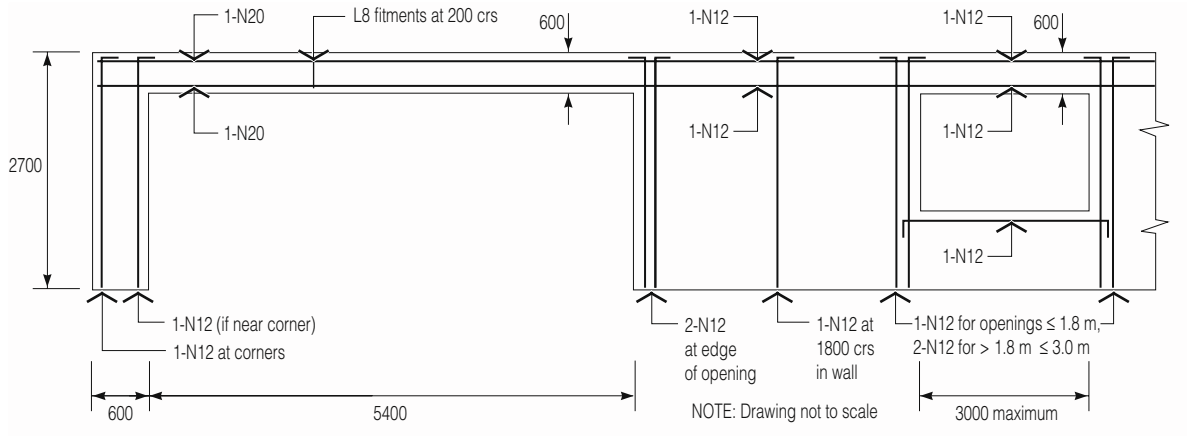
Wall Reinforcement for 190-mm Leaf for Wind Classifications N4 and C1 and 2700-mm Wall Height
